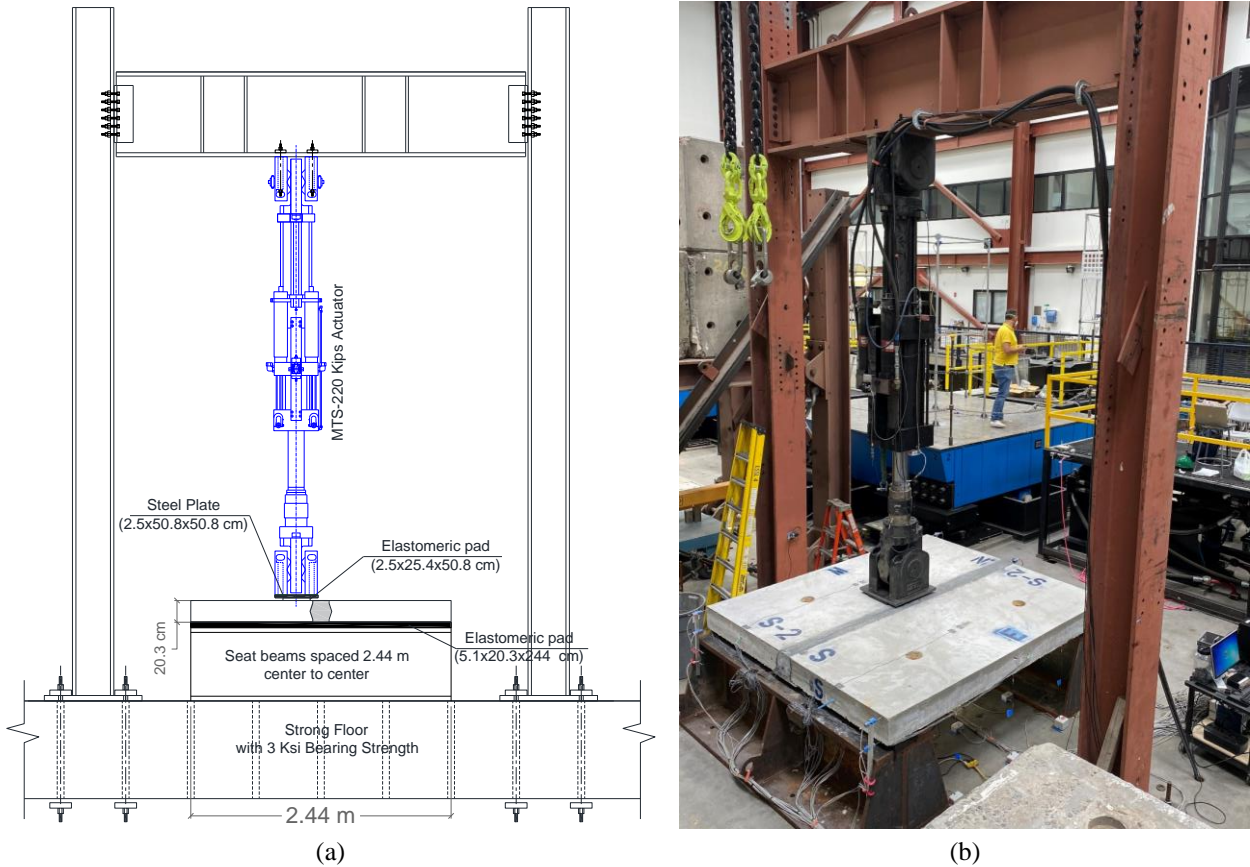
Experimental test setup (a) schematic drawing of the test setup, and (b) photograph of the actual test setup at UNR.
